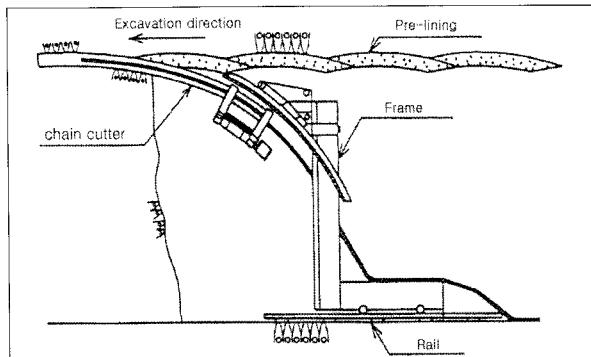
Excavation method of the slit concrete pre-lining using chain cutter
